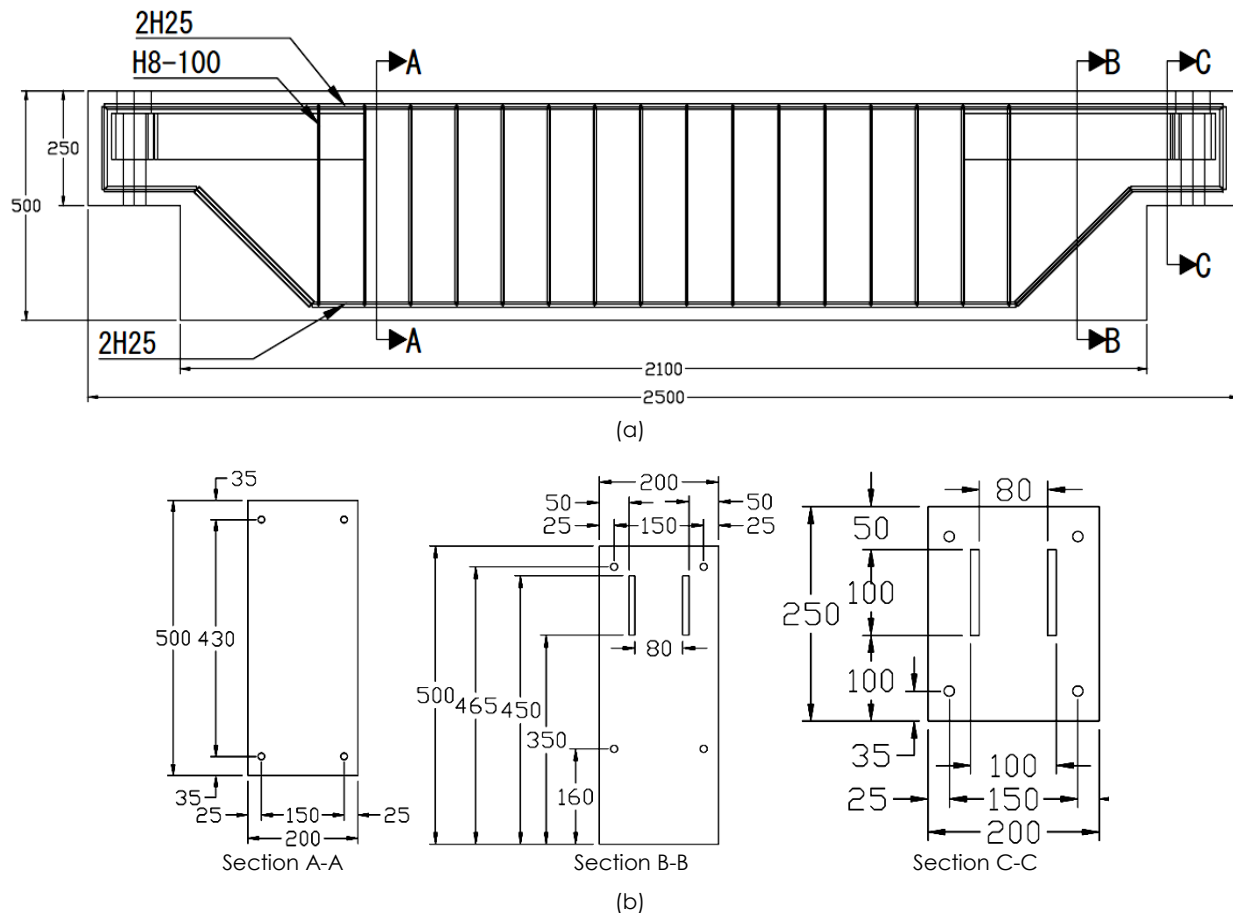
View and details of IBS SRLWAC beam: (a) 2D front view; (b) cross-sections
